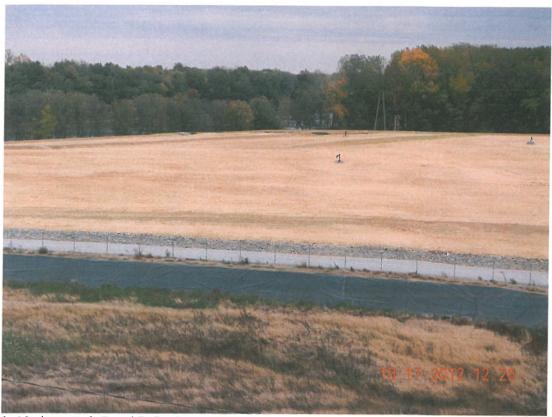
A - Ash Pond D Project - Post Construction facing southeast
